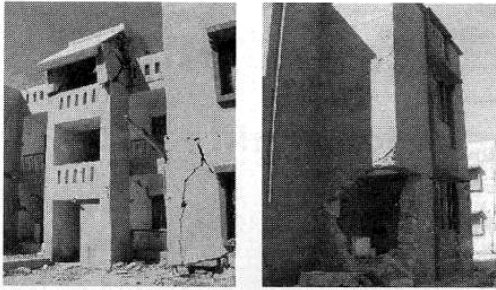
Imminent collapse of staircase tower and collapse of the corner of two-storey large block stone masonry houses without lintel bands in Bhuj.
